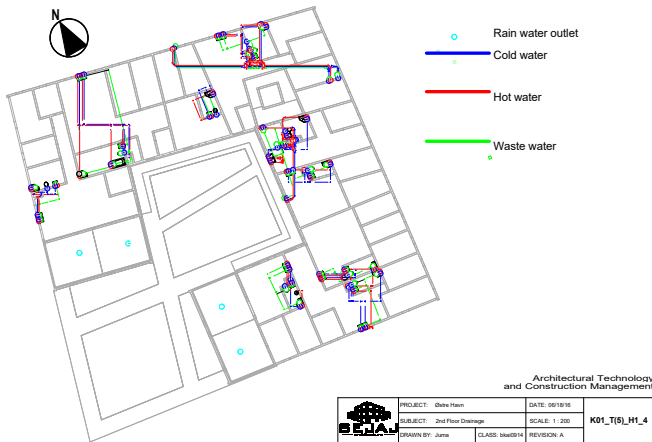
Water Supply and Drainage Plans: 2nd Floor
